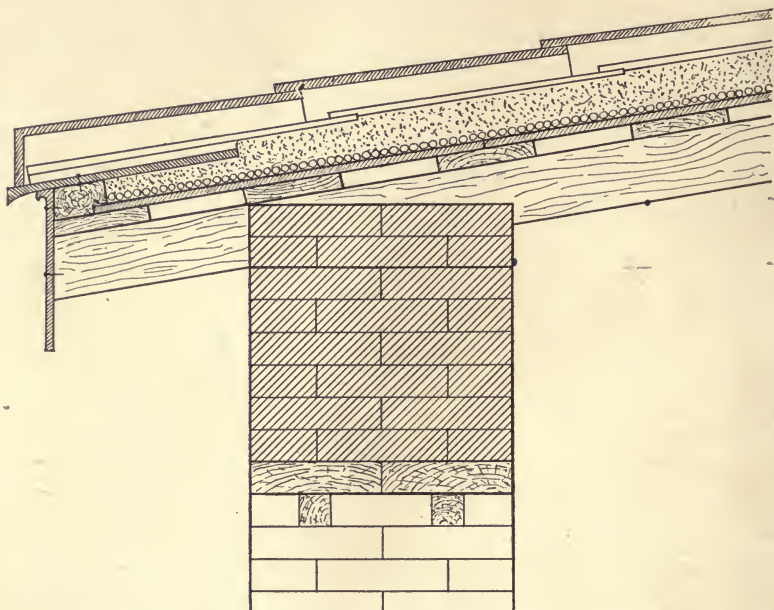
SECTION SHOWING ROOF CONSTRUCTION.
